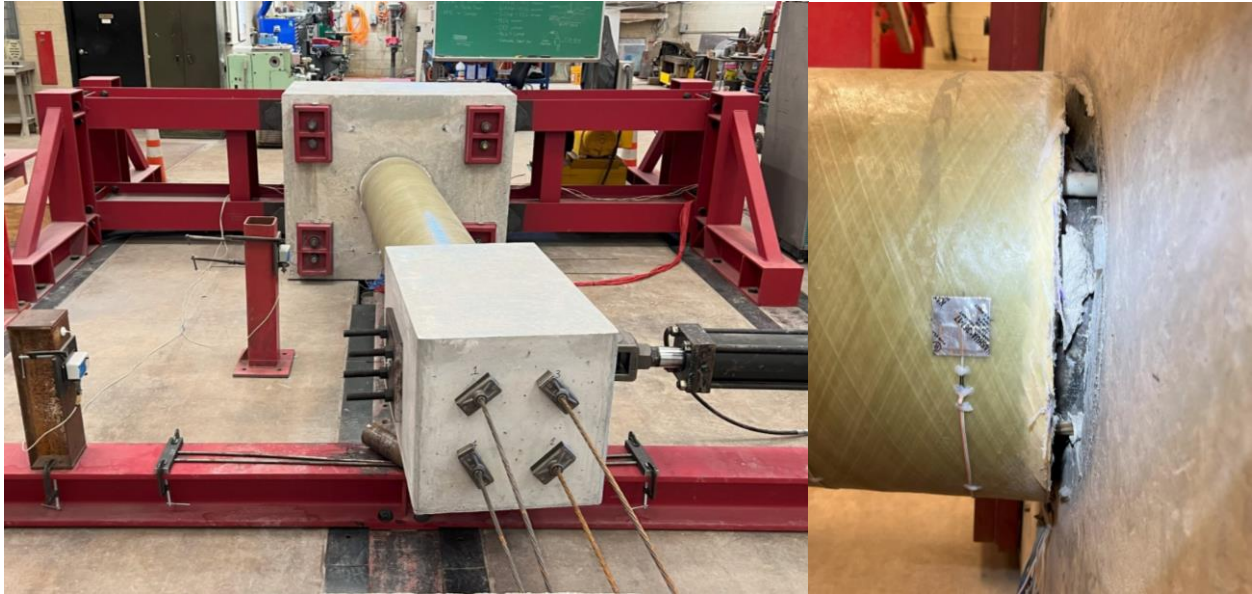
UHPC 2 Column Specimen (l) and GFRP Tube Separation During Testing (r)
